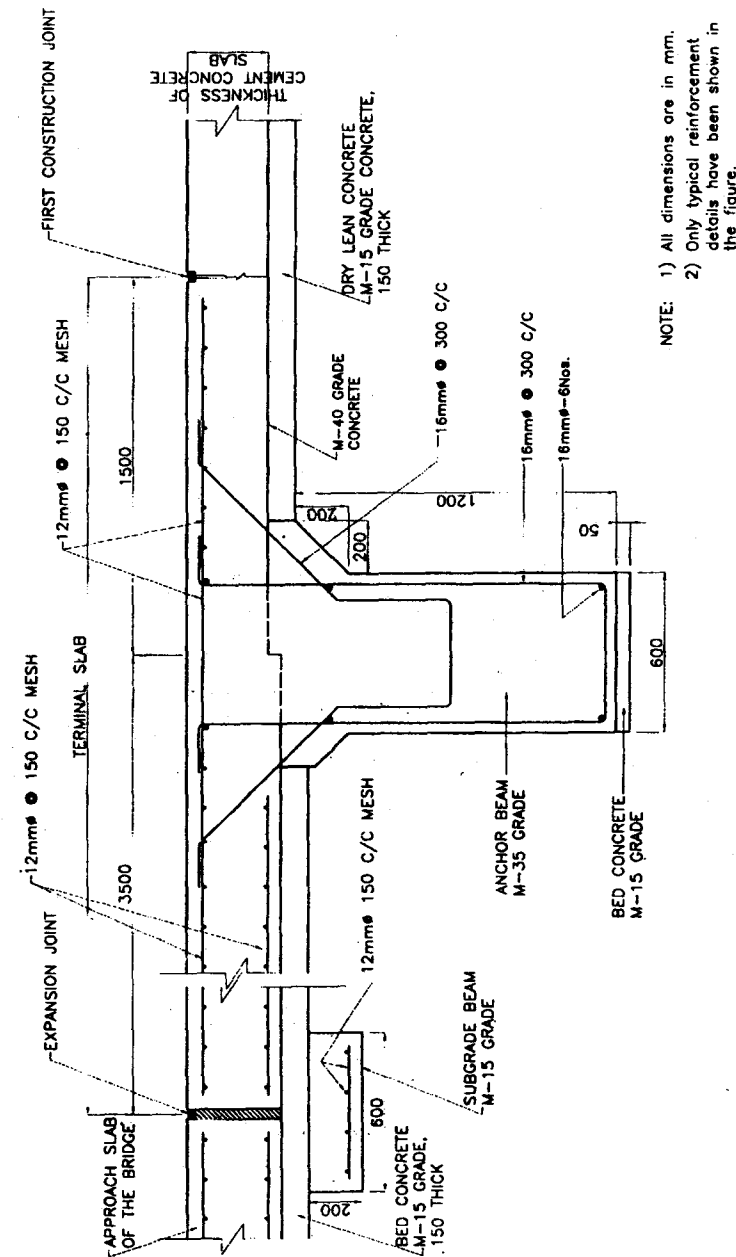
Details of Anchor Beam and Terminals Slab (Clause 8.5.2)
